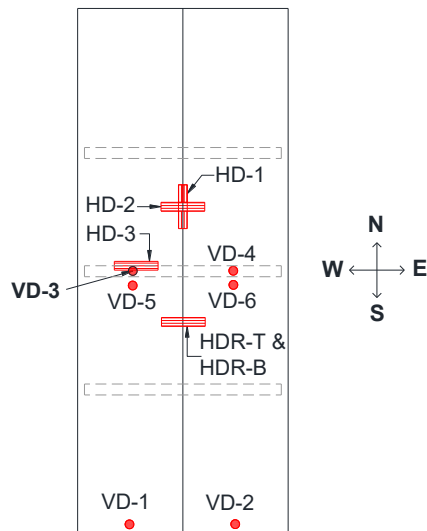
Strain Gauge Plan for the Glulam Timber Slab Bridge Specimen
